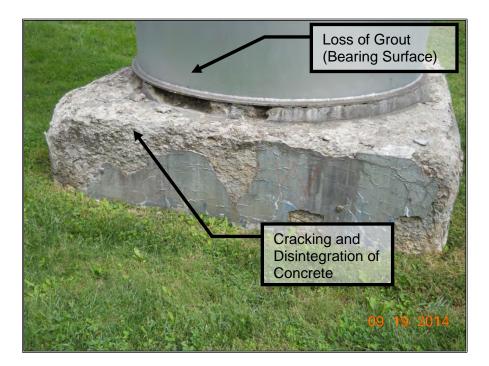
Severe Pattern Cracking and Disintegration of Concrete at Riser Footing.
